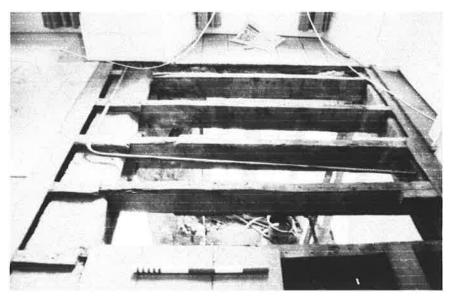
Floor construction exposed prior to removal for lift shaft, first floor MCR TV room
